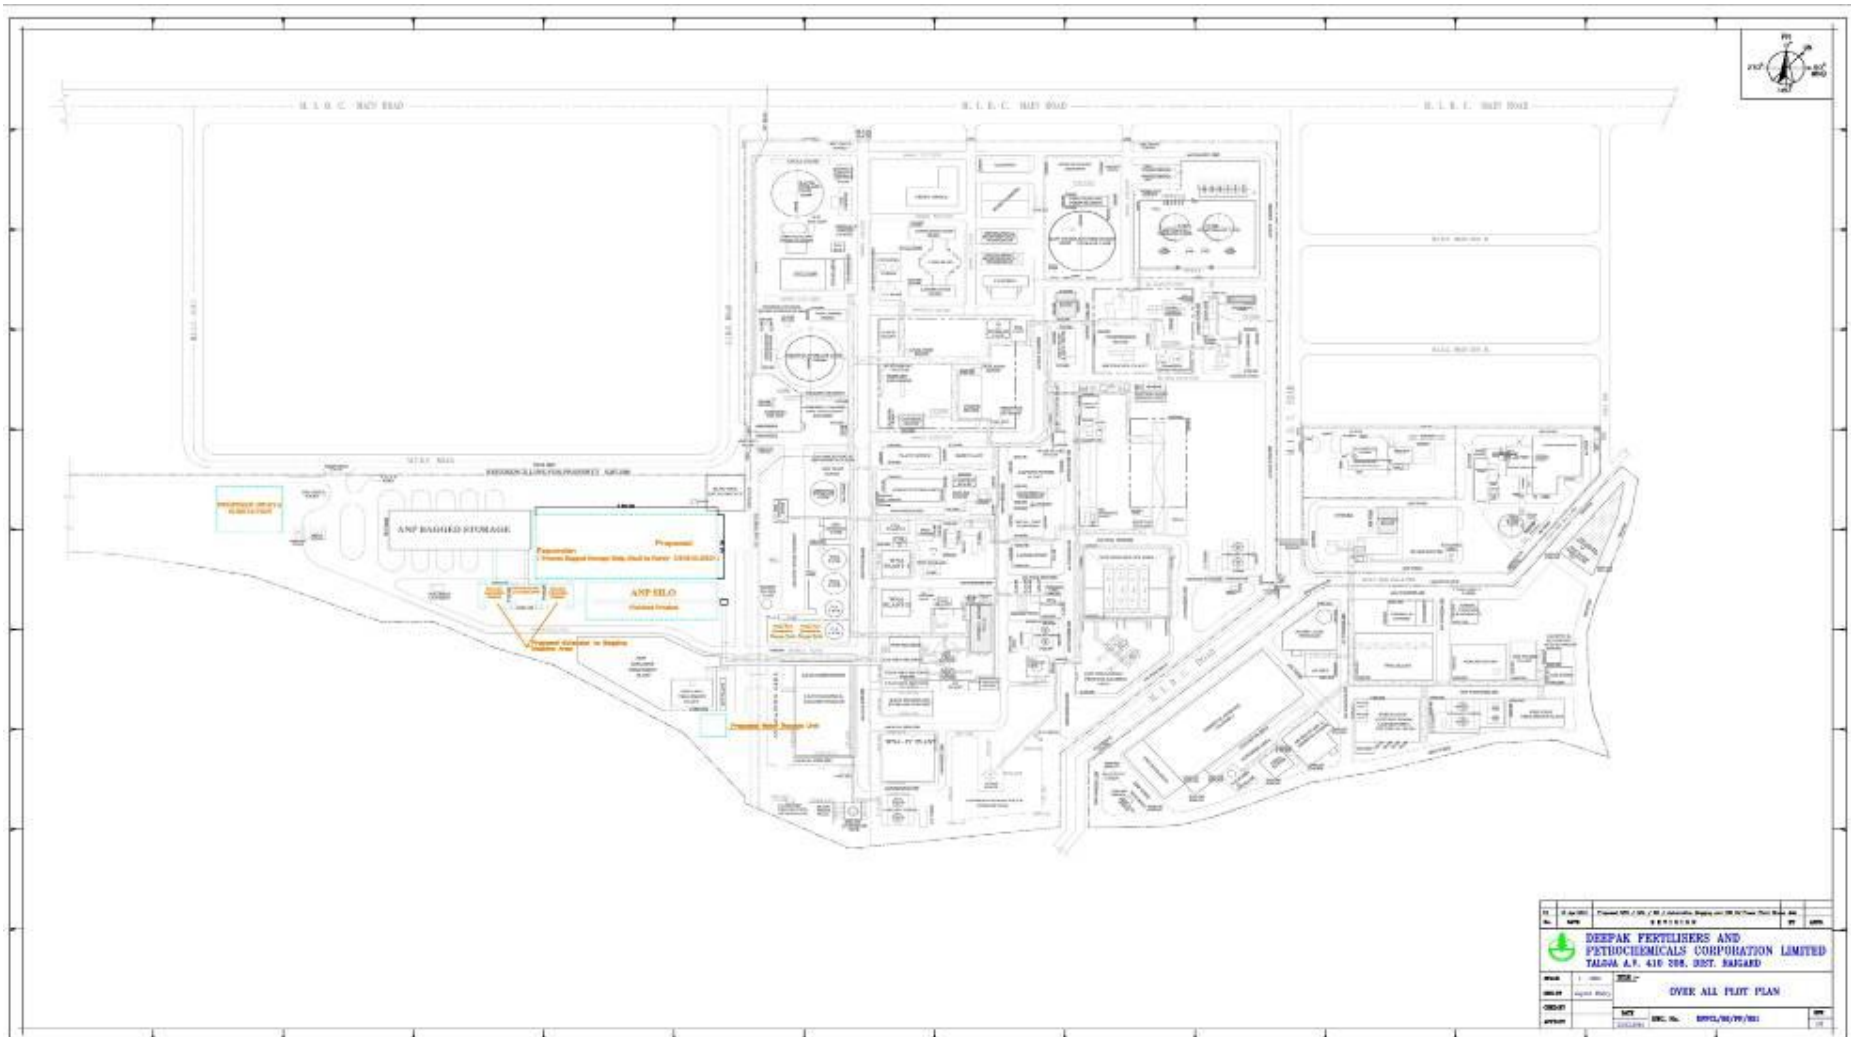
Plant Layout Map Demarcating Proposed Expansion Unit
